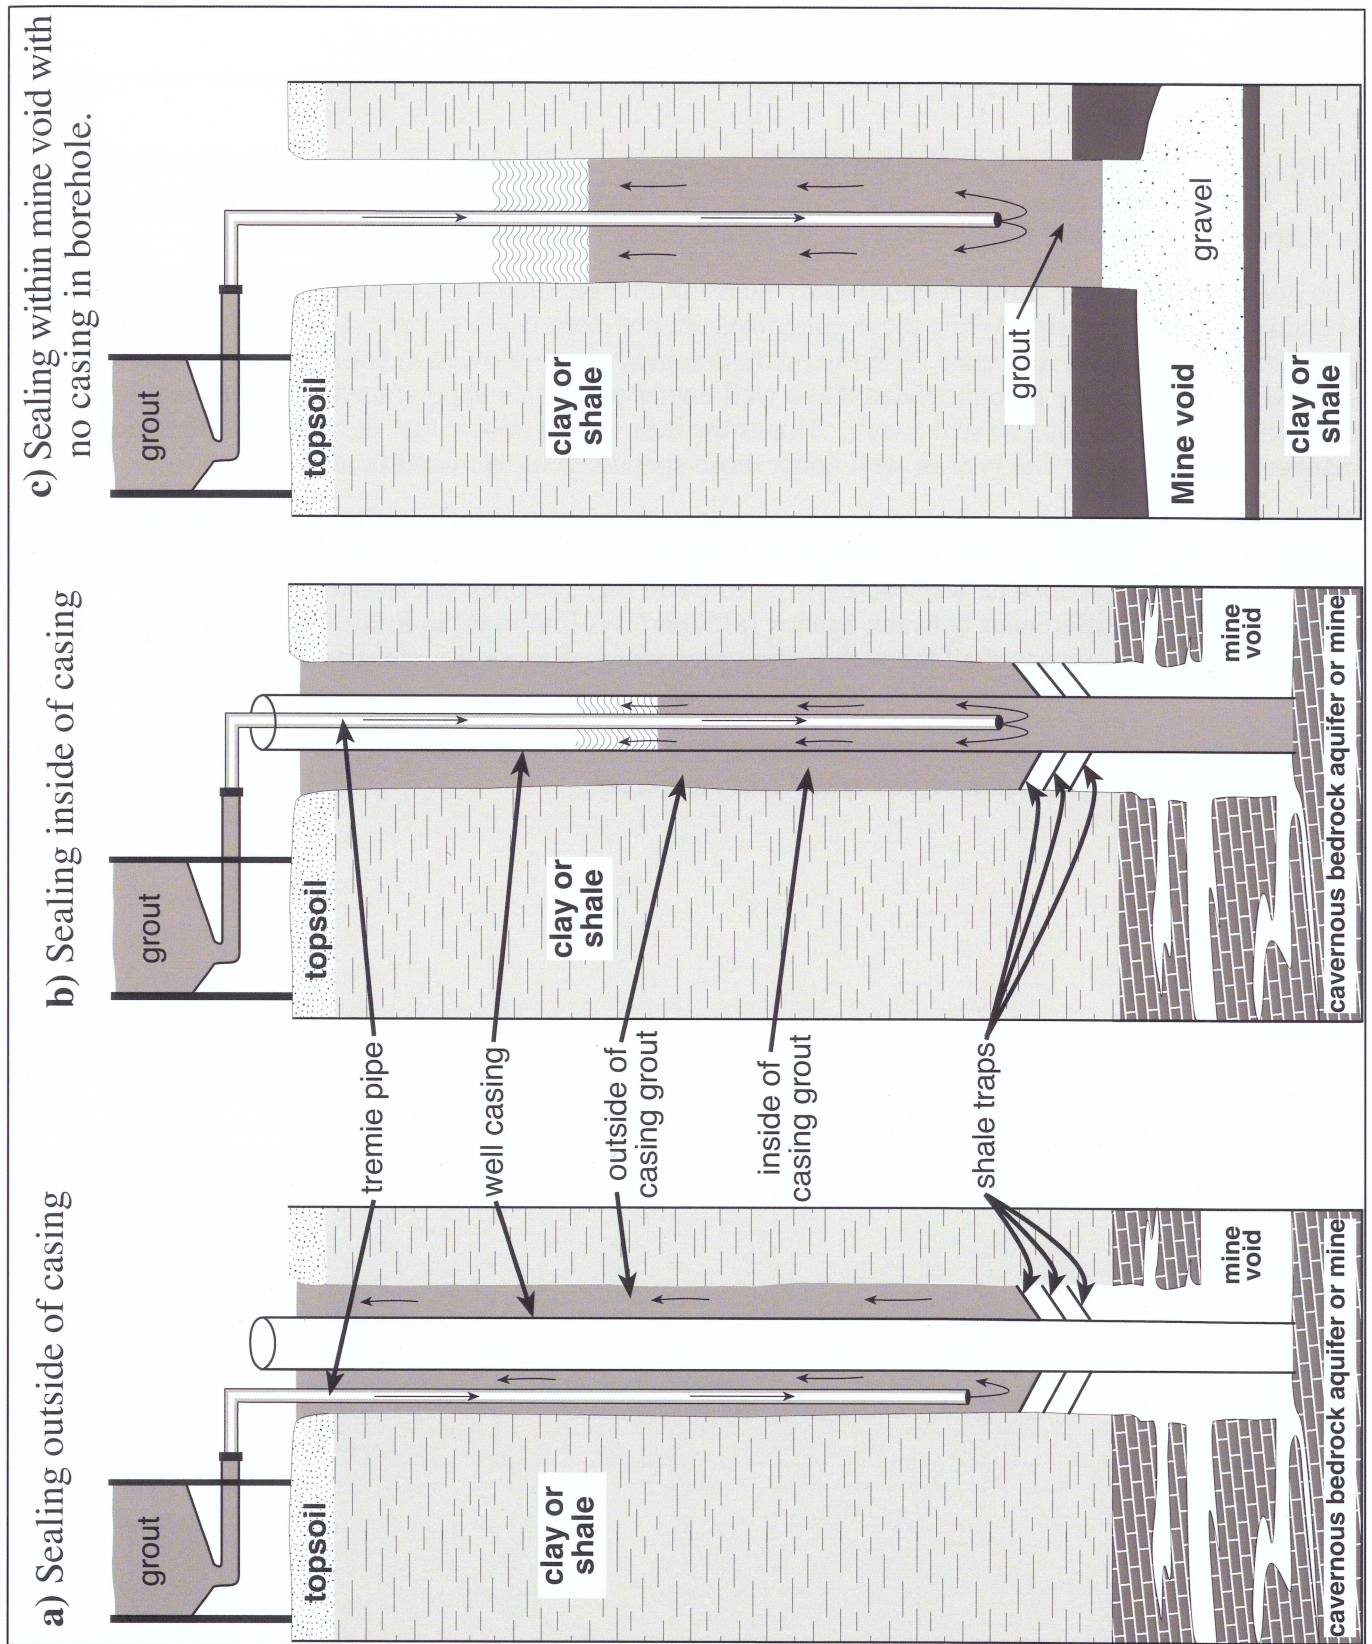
Sealing procedures for wells penetrating fractured or cavernous formations. a) Casing has been installed to the bottom of the borehole with three shale traps installed a few feet above the top of the void(s). Pressure grouting is occurring in the annular space. b) Pressure grouting inside the casing is occurring. c) The void has been filled with gravel up into the borehole and pressure grouting of the borehole is in process.
